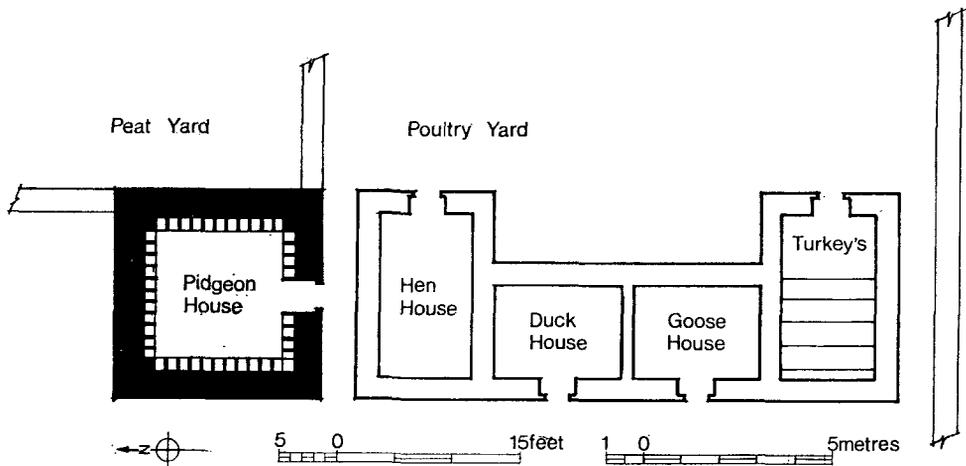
Craigston Castle: Dovecote and proposed poultry house
